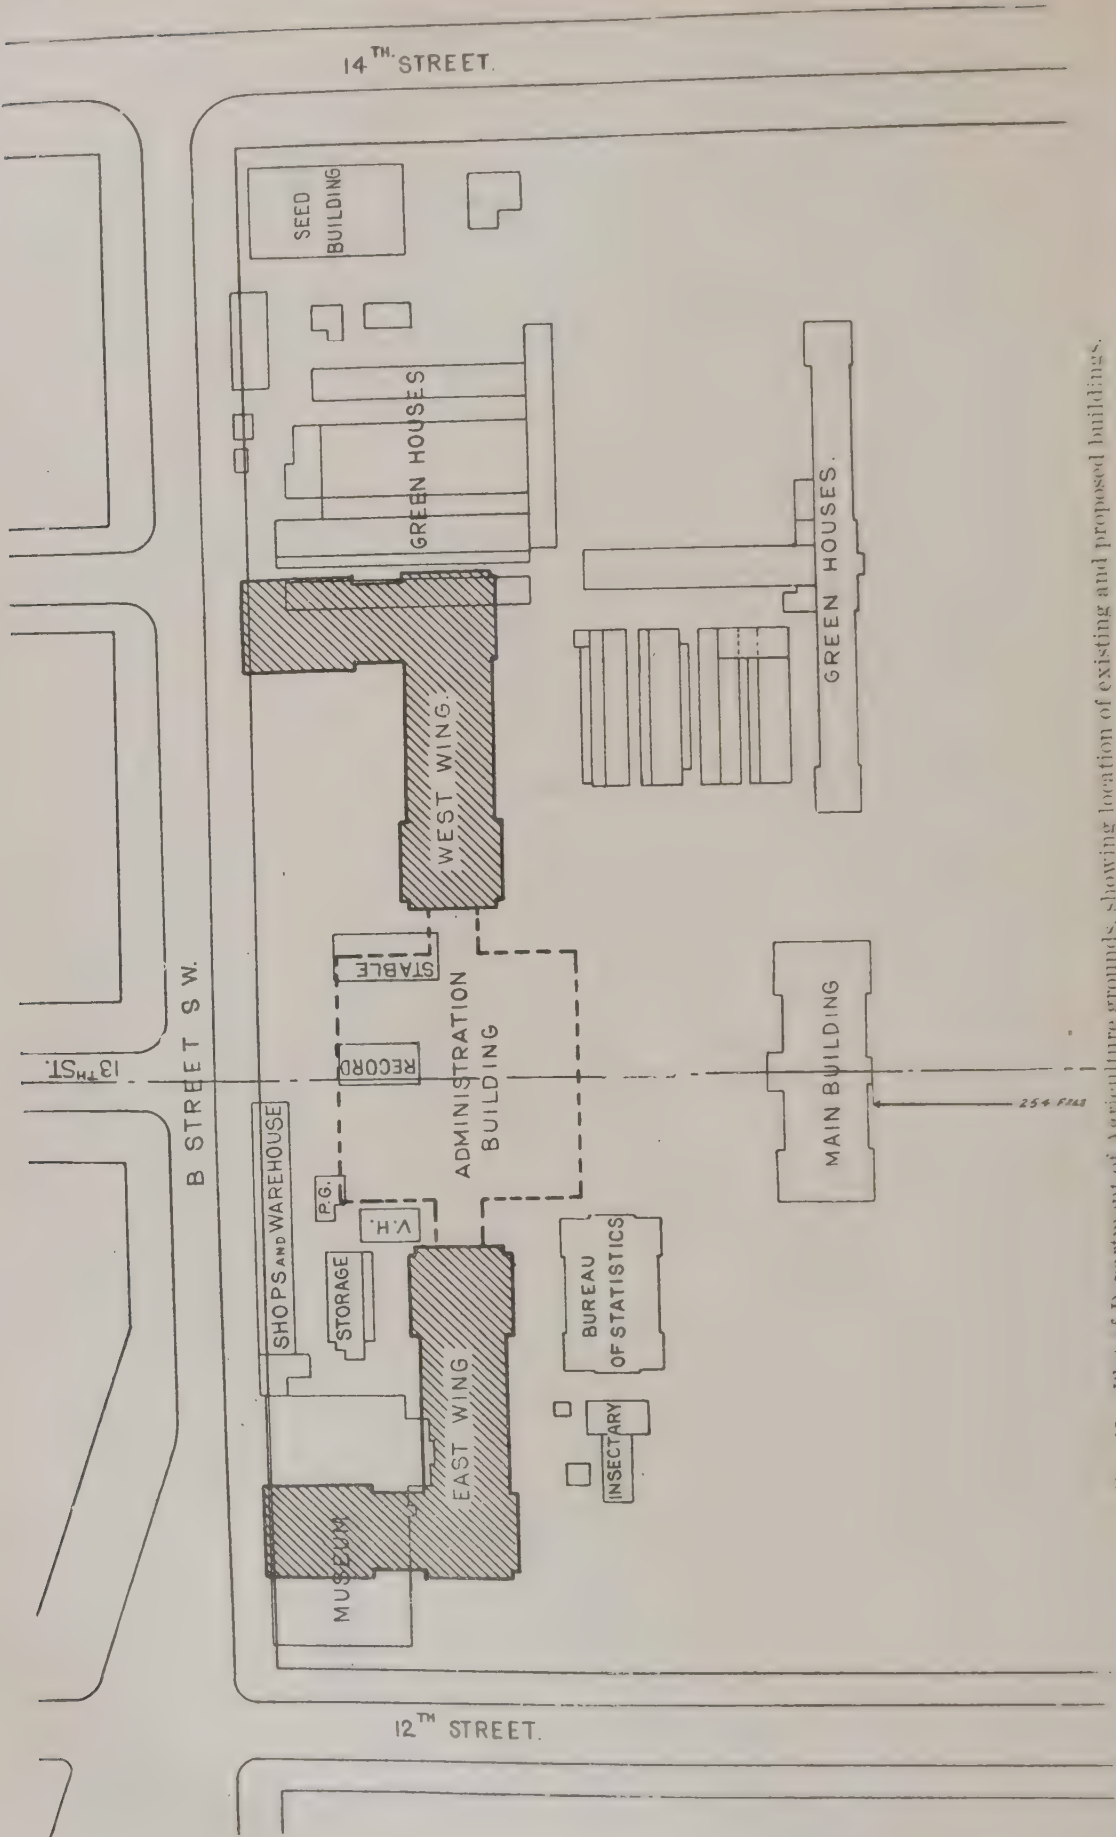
Plat of Department of Agriculture grounds, showing location of existing and proposed buildings.
